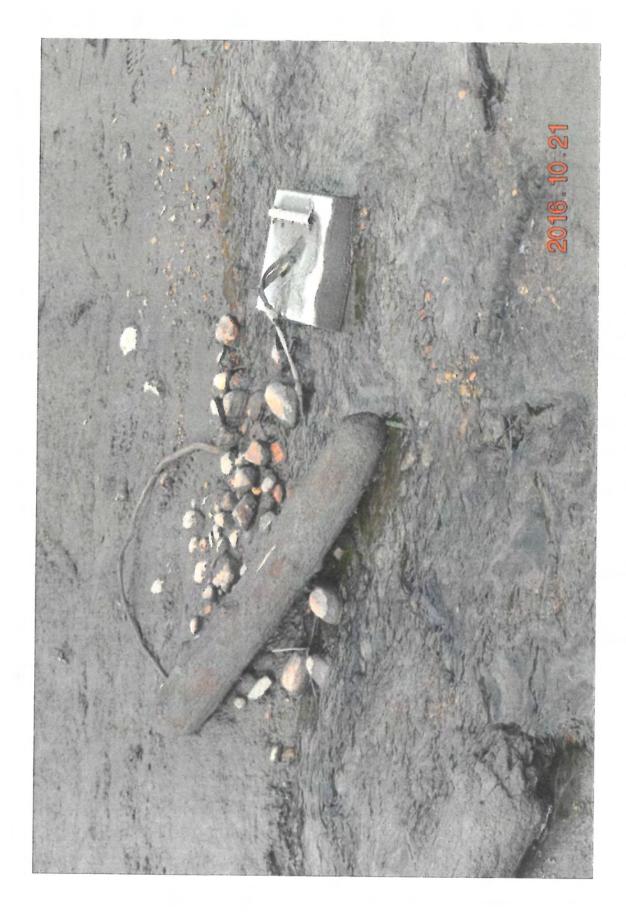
PHANTOM ANCHOR AND CABLE IN CHANNEL
